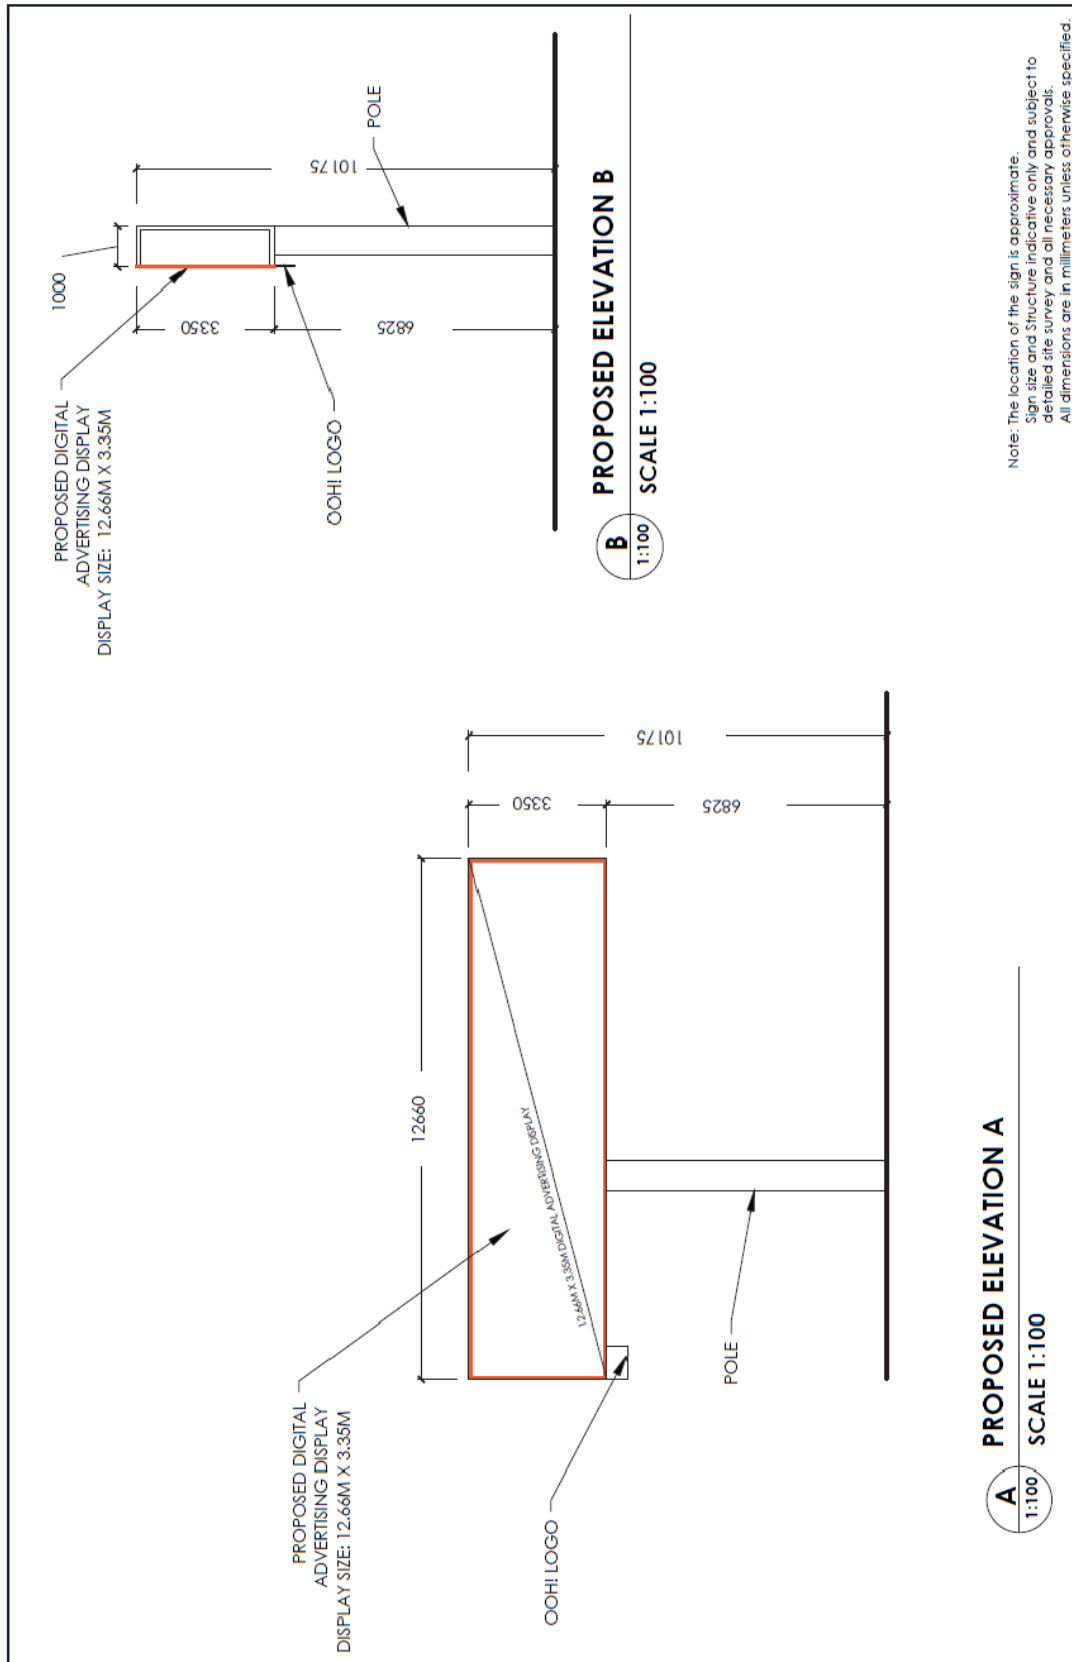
Proposed elevation of the billboard and advertising signage structure (source: oOh!media)
